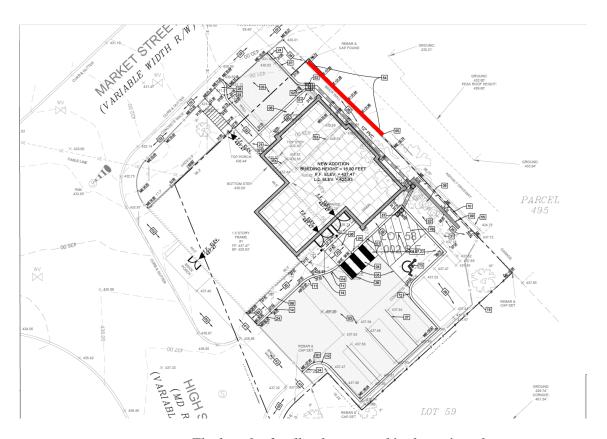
Excerpt of Sheet C2.01. The length of wall to be removed is shown in red.
